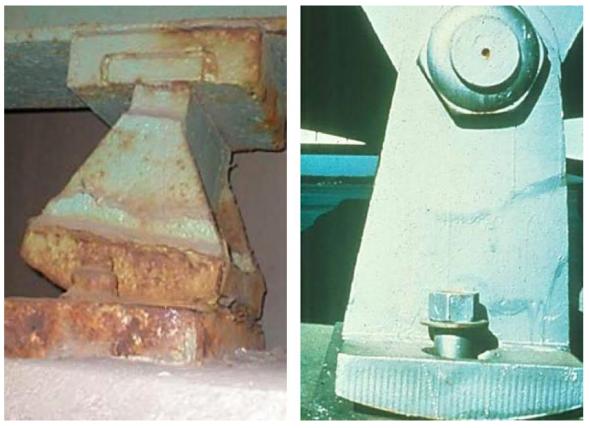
Examples of Rocker Bearings. Unpinned (left) and pinned (right)
